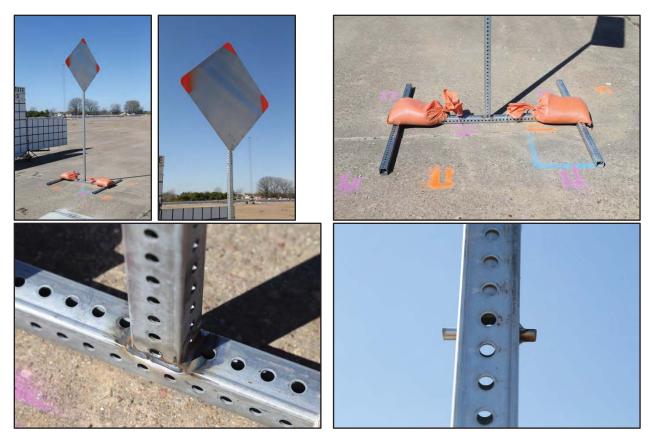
Option C Temporary Work Zone Sign Support Used for Test No. 490026-2-3.
